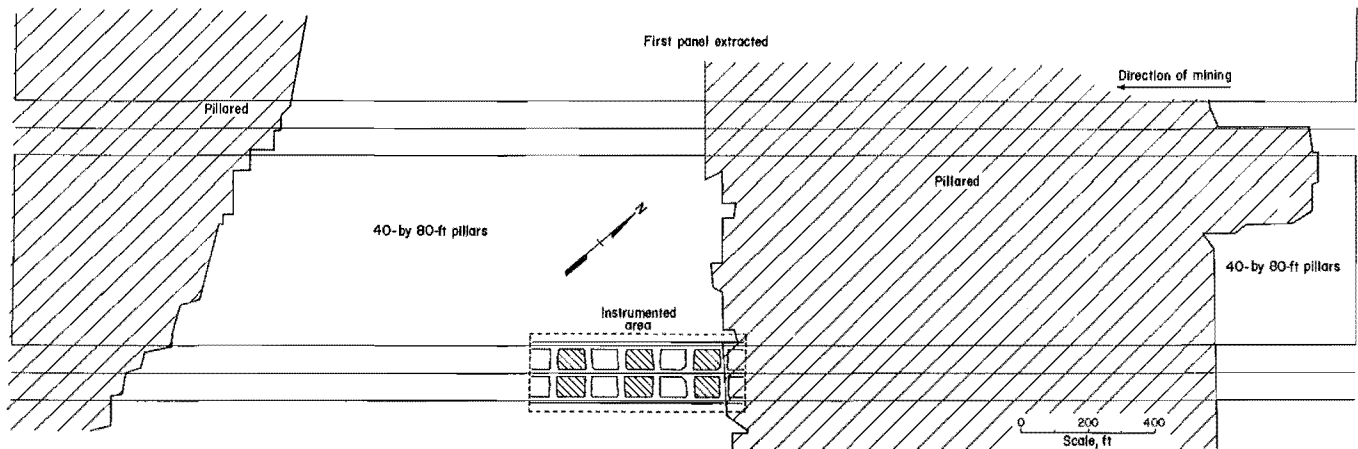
Overlay of Upper Banner room-and-pillar workings on Lower Banner longwall panel.
